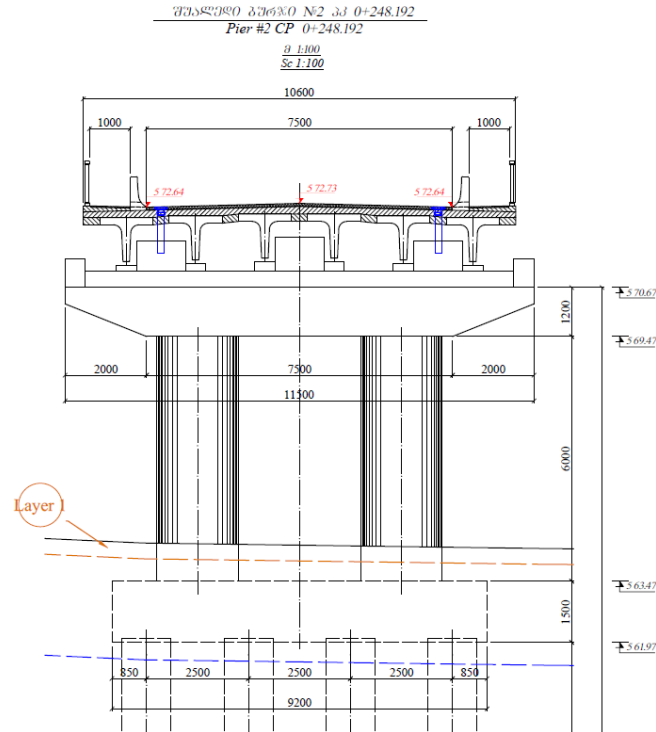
Typical Cross Section of LR03 Road Bridge
